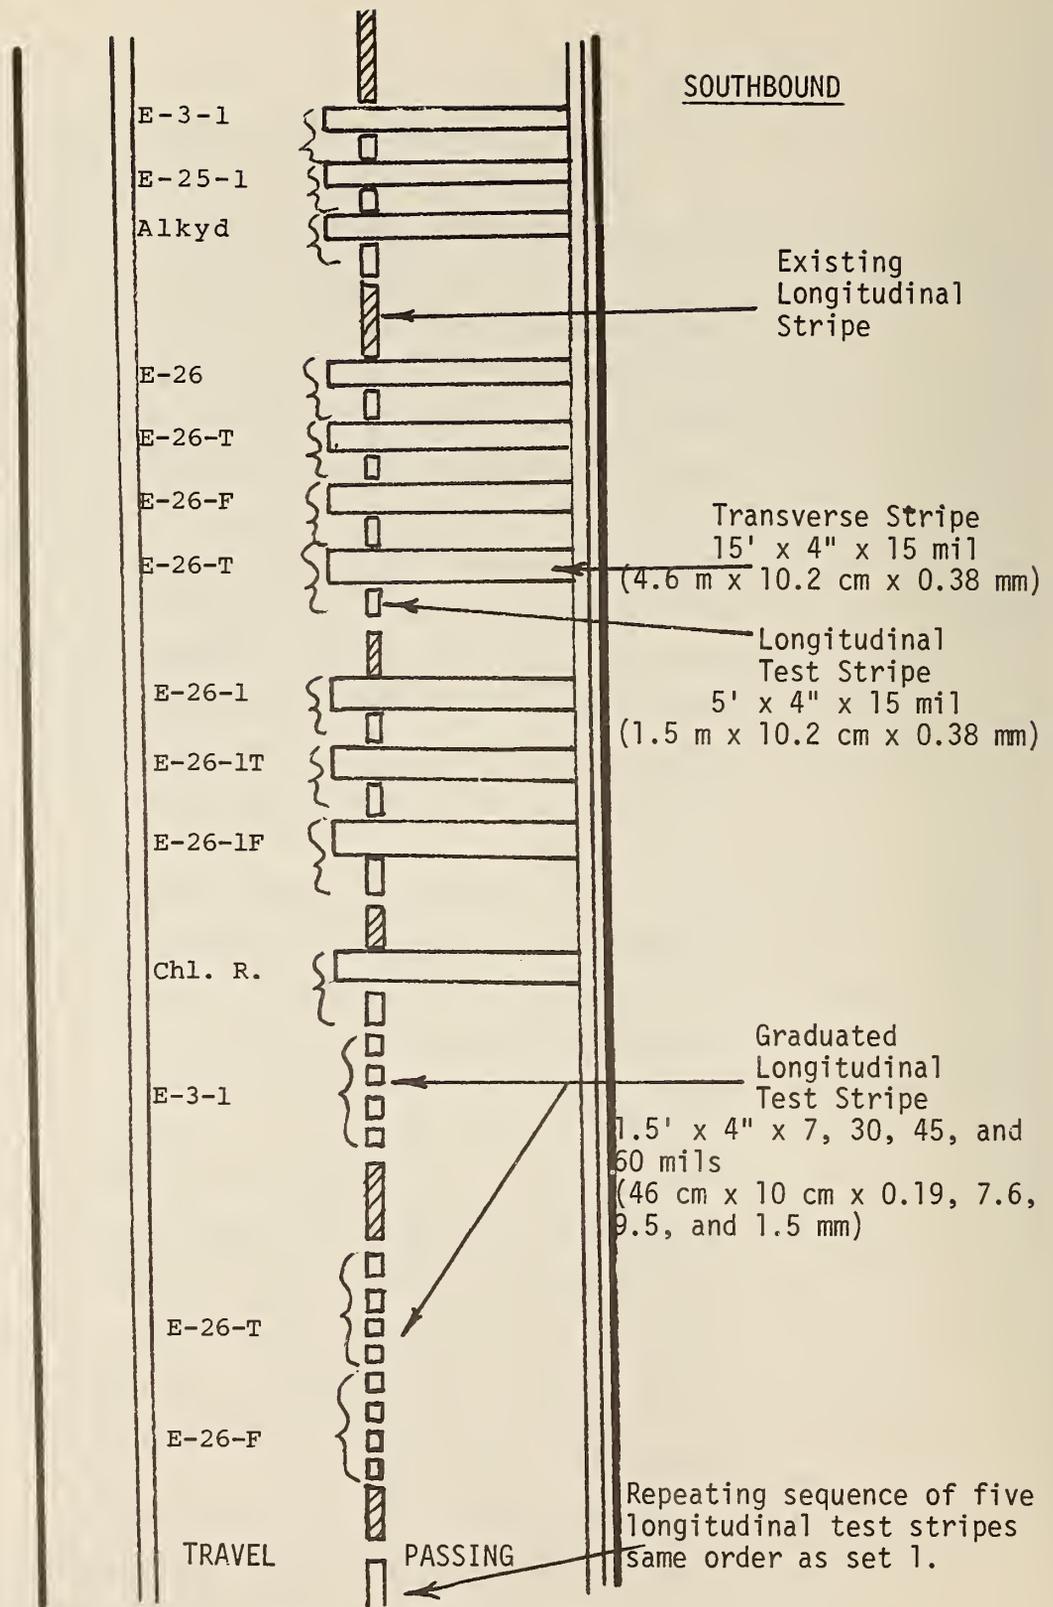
SECOND ROUTE 1 STRIPING LAYOUT
